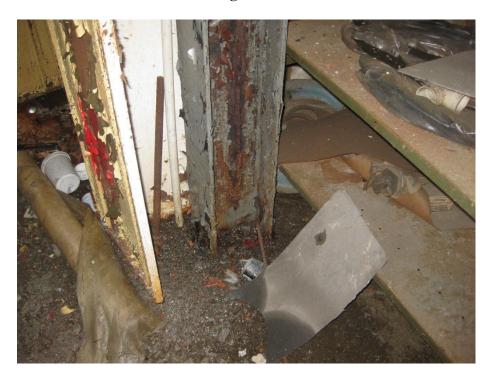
Corrosion at Steel Columns and Baseplates
